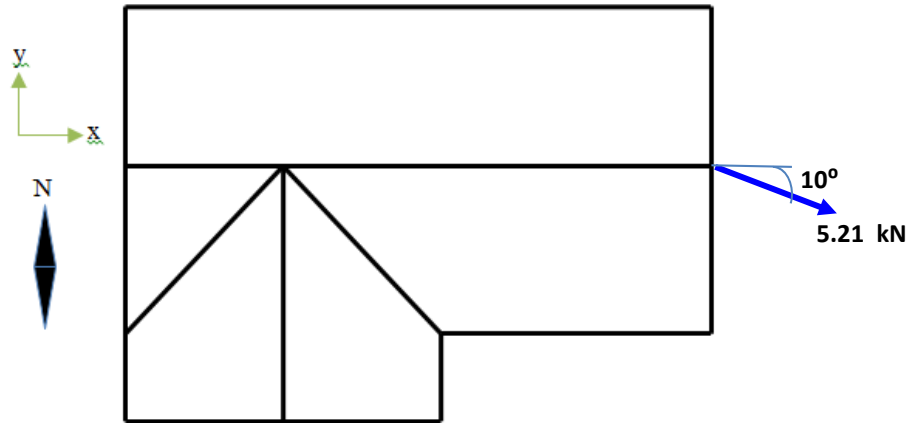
Load Case 14 – 5.21 kN Applied to Roof Ridge of East Gable-End (at -10 degrees)
